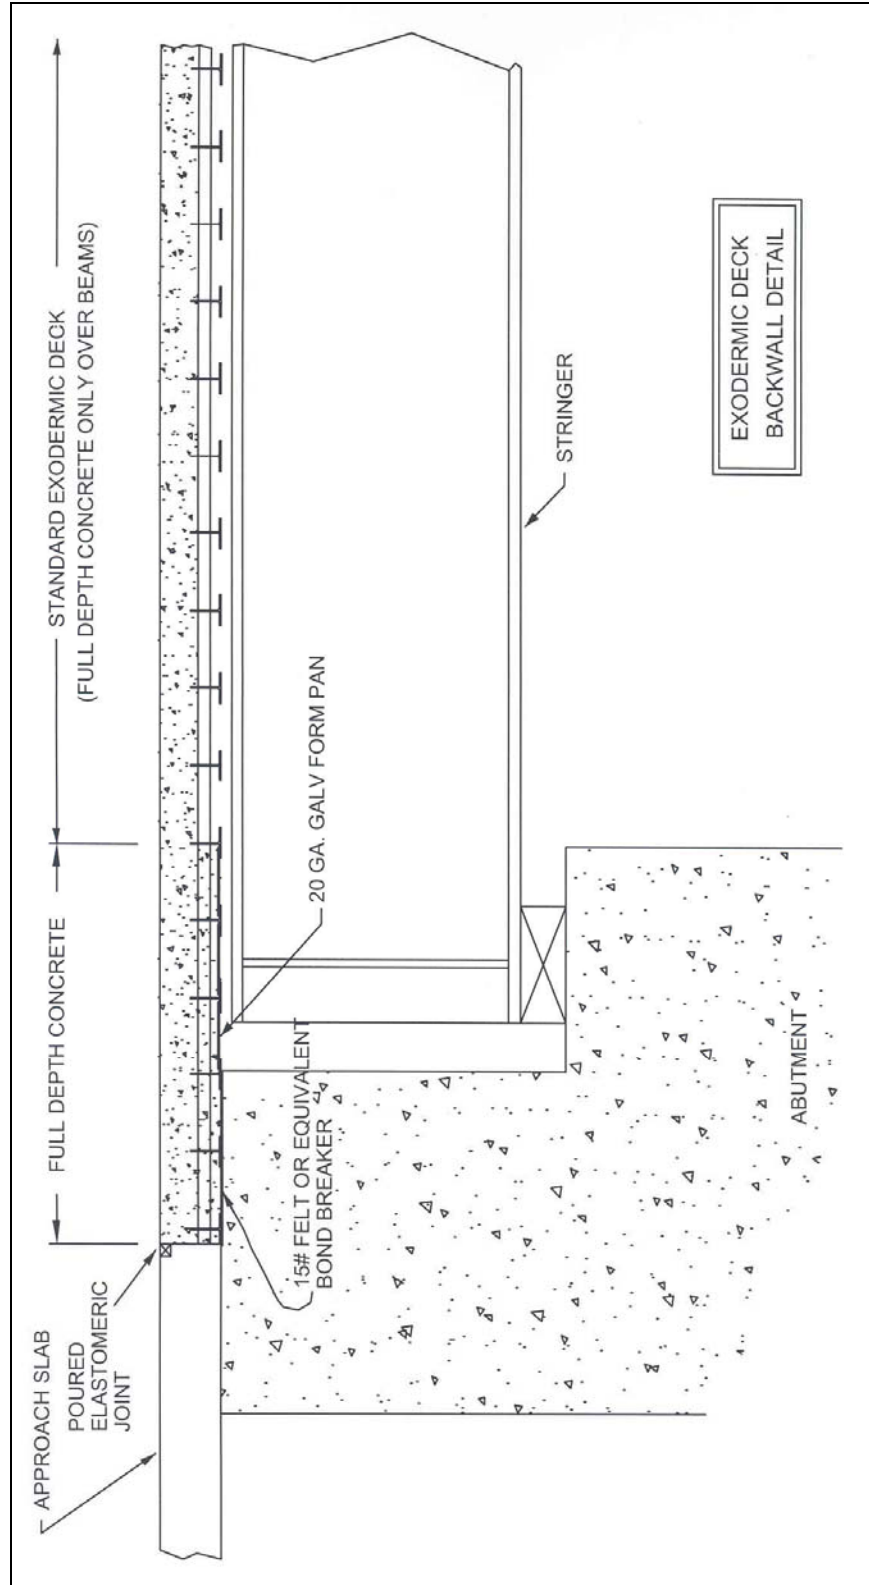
Typical Exodermic deck backwall detail (Exodermic Bridge Deck, Inc., 2003)
